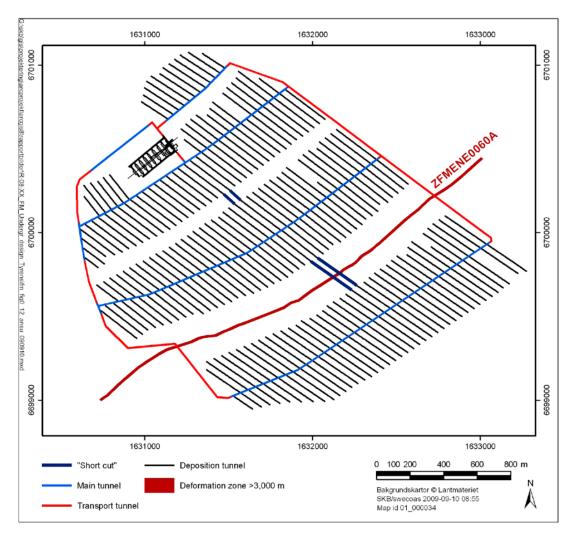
Position of temporary transport tunnels, section at 470 m depth (RHB 70).
